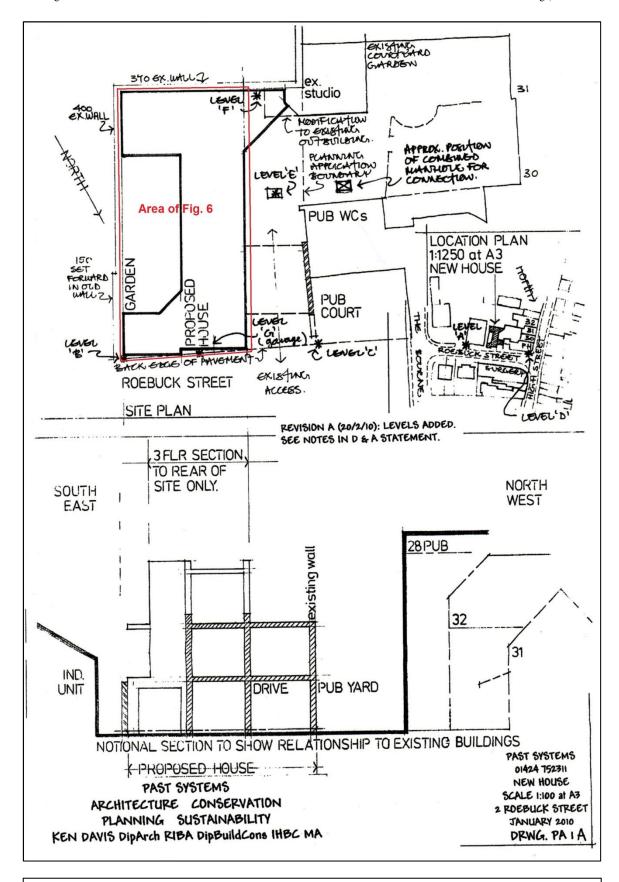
2 Roebuck Street, Hastings: Development plan showing location of Fig. 6 (adapted from architects drawing)
